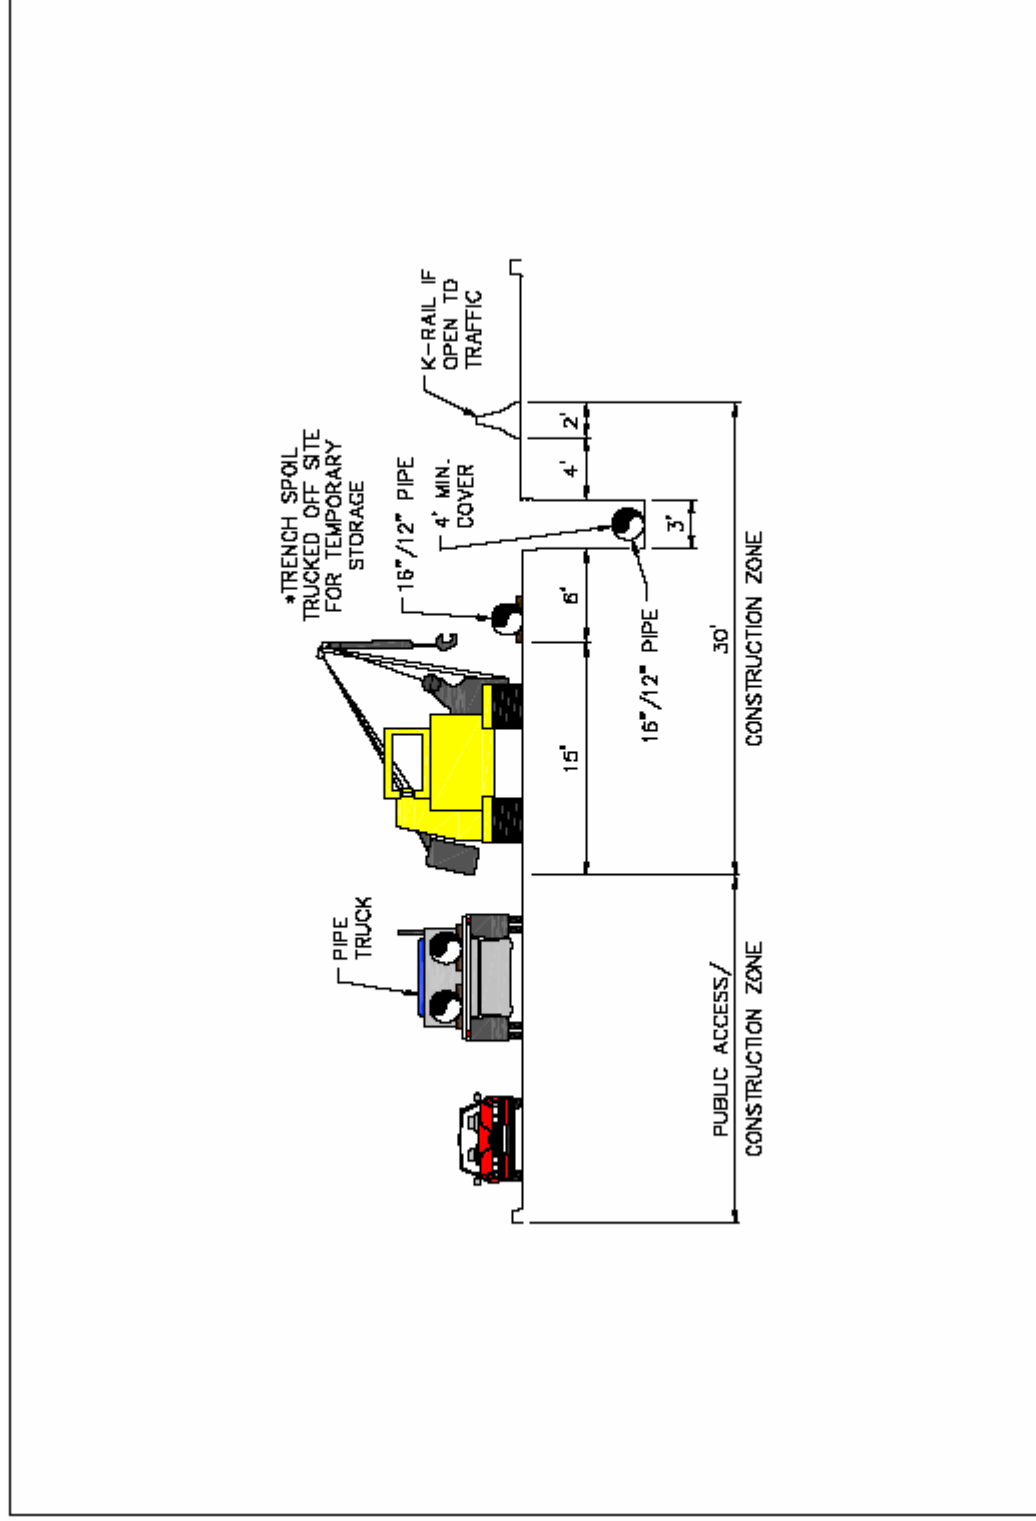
Temporary Construction Workspace in Road and Road Shoulder Areas.
